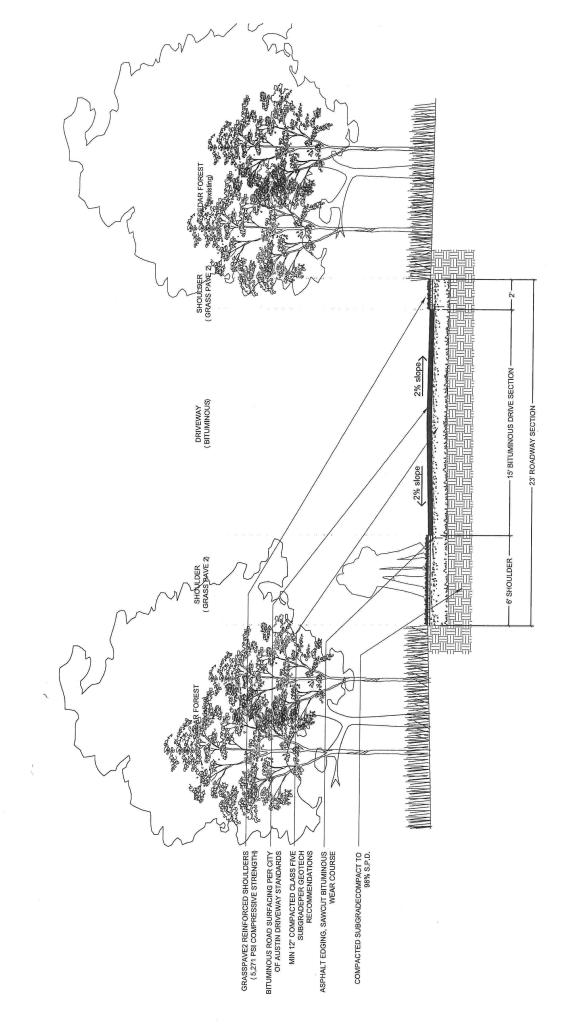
EXHIBIT M - DRIVEWAY DETAILS - (4 of 5)
